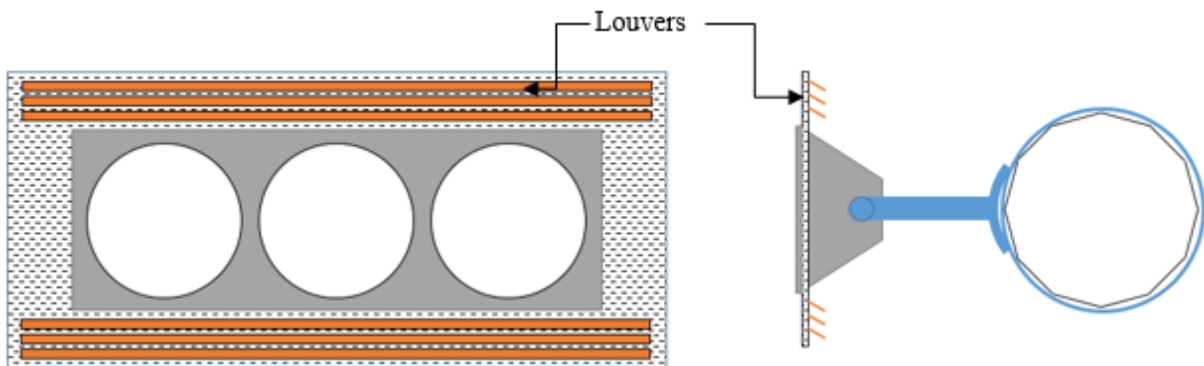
Front and side elevation view of signal with Extended Louver modification
